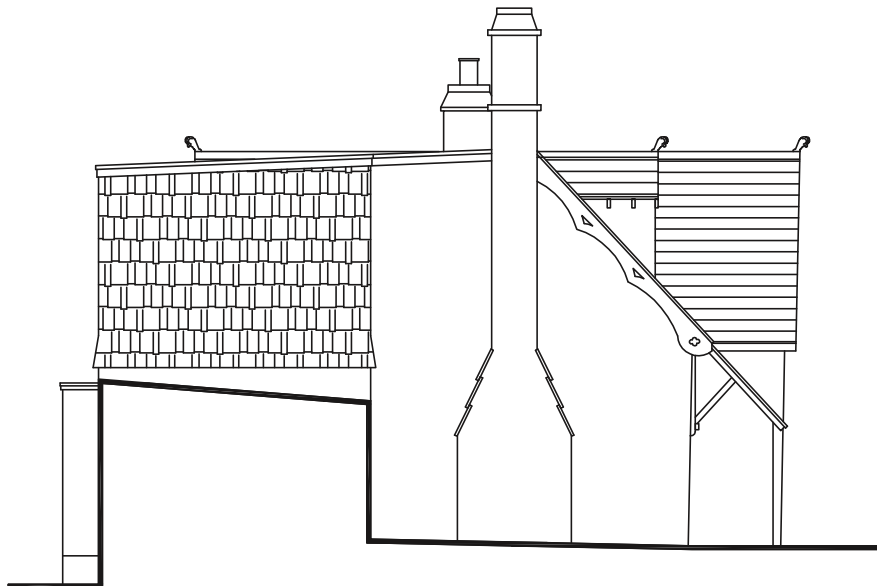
Cable Cottage, Salcombe; south west exterior elevation.
